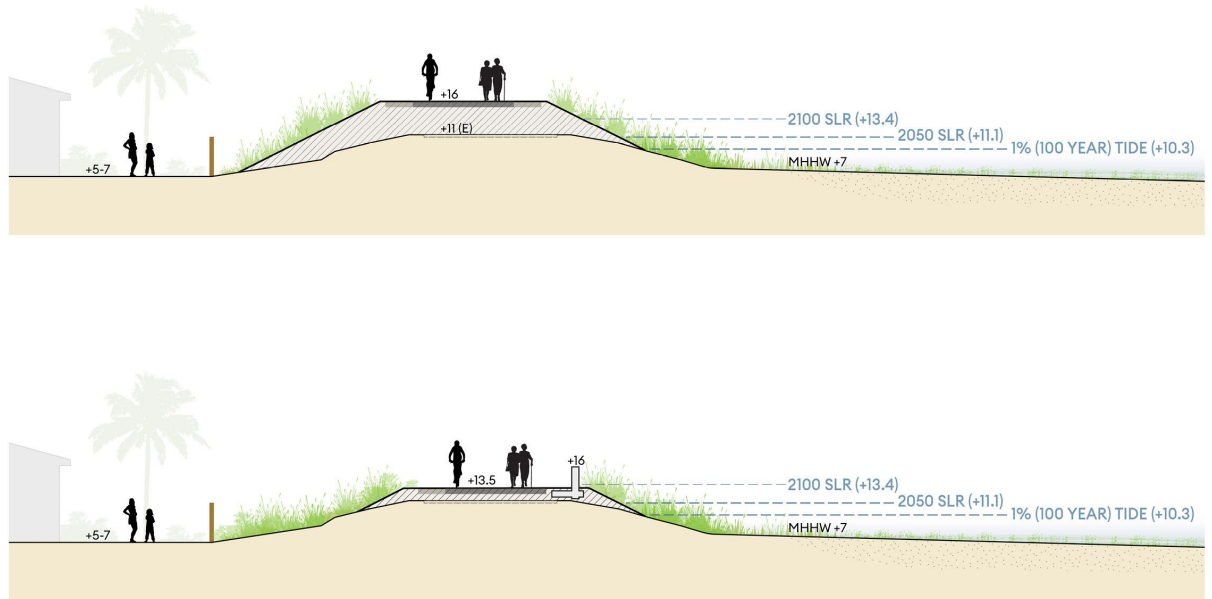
Elevation View of FEMA +3.5 Design Elevation (Not Recommended)
